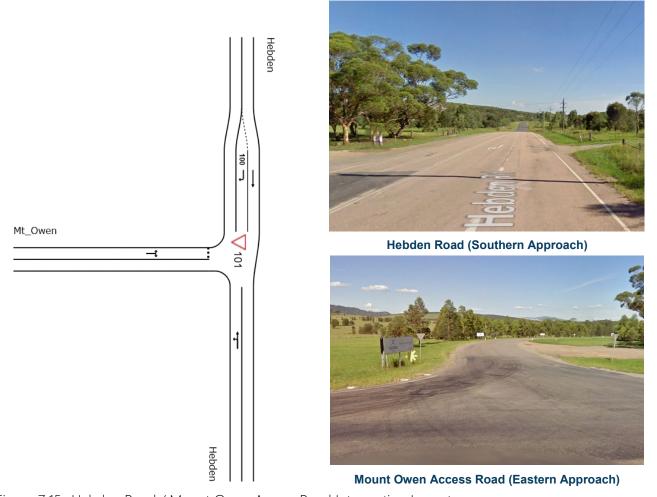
Hebden Road / Mount Owen Access Road Intersection Layout
